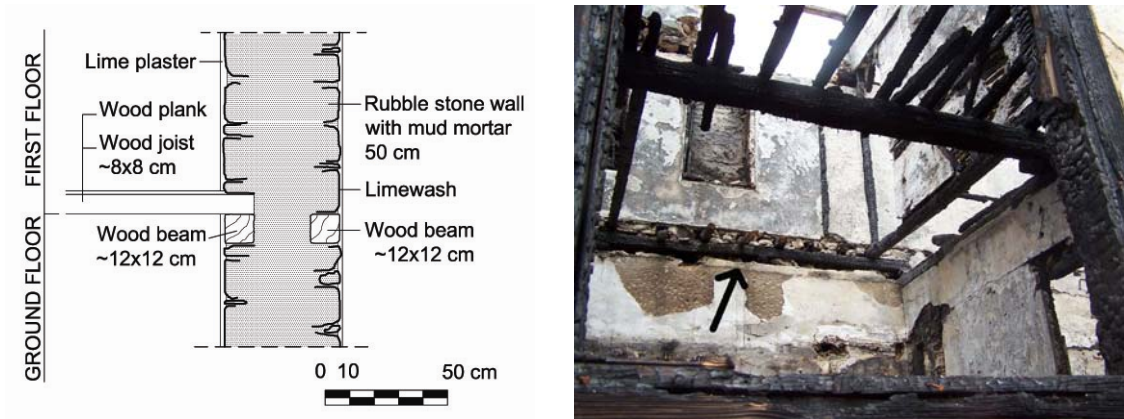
Connection detail of first floor joists with rubble stone wall (Şeyh Cami St. No: 32)
